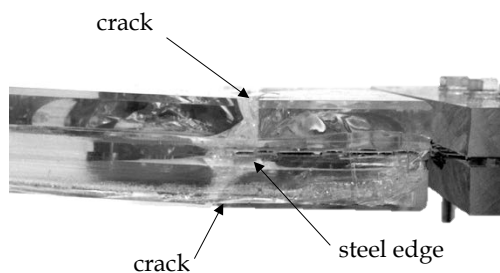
Close up view of the lower edge of specimen showing both glass broken at the metal edge area.
